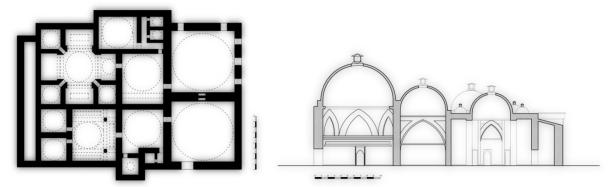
, 4: Plan and Section of Daut Pasha Hamam
